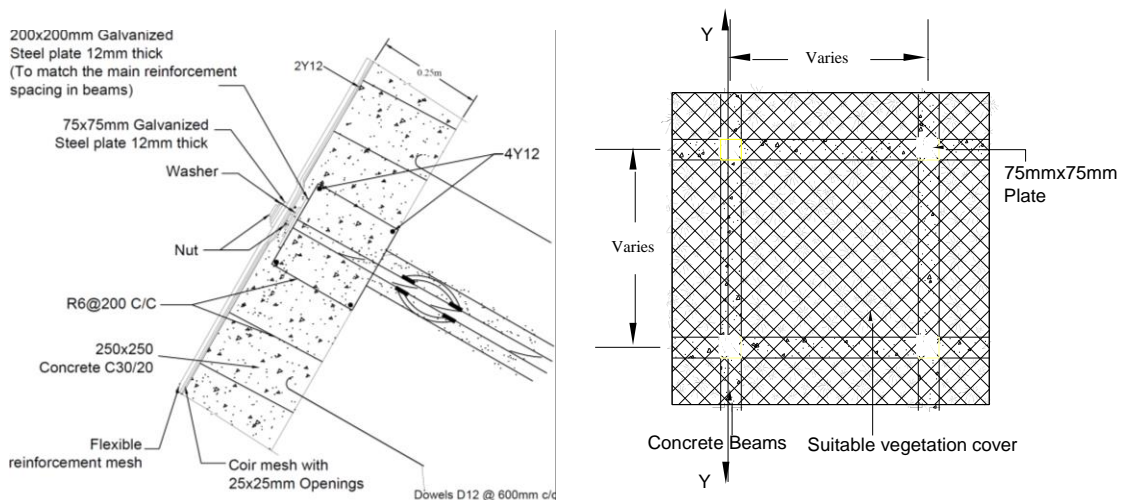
Details of a typical Grid Beam system used in Sri Lanka
